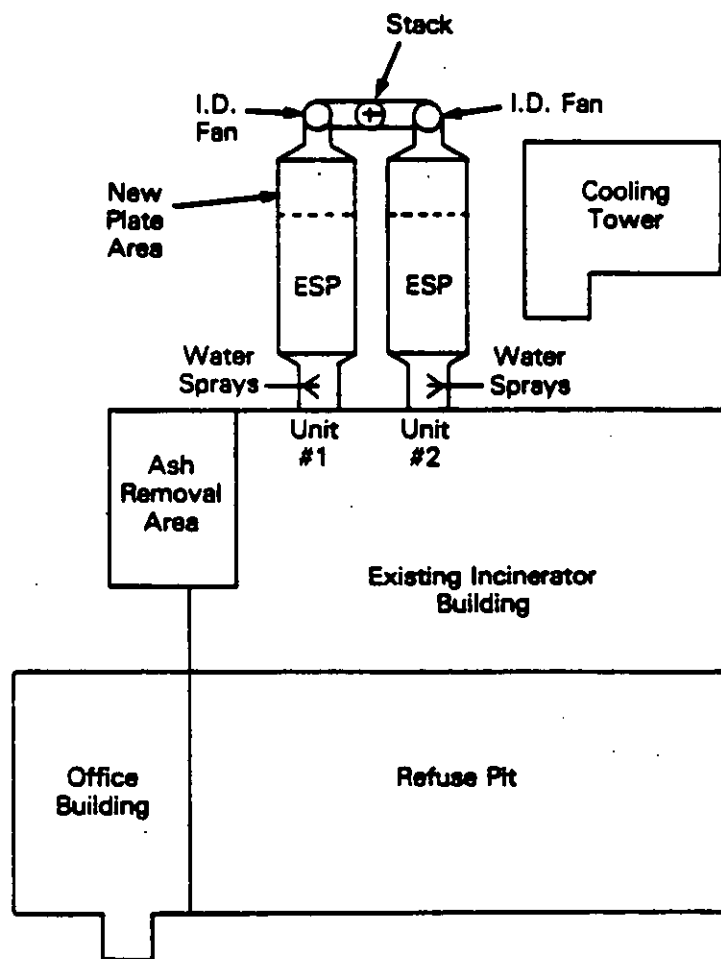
Plot plan of new ESP plate area equipment arrangement.
